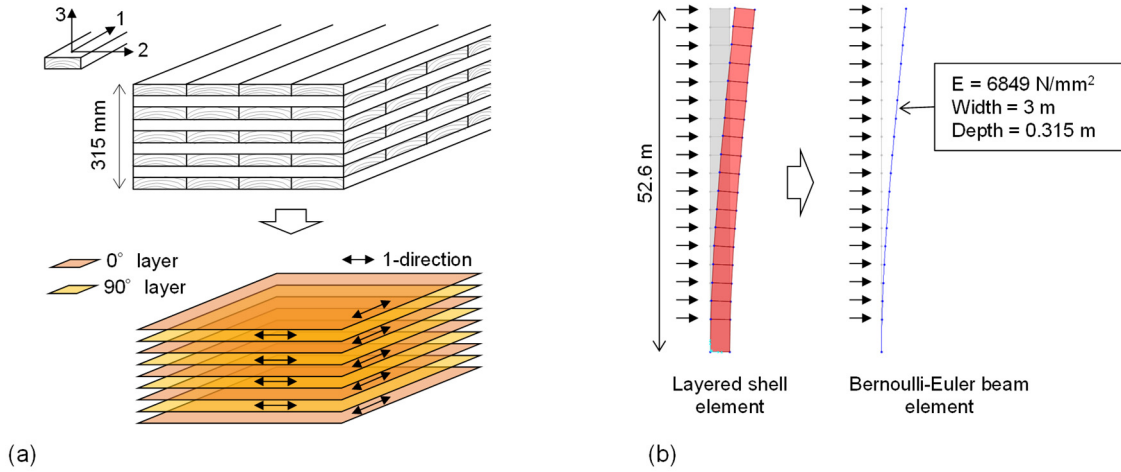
Modelling of the CLT wall panel: (a) Layered shell element for the CLT, (b) Equivalent Bernoulli-Euler beam for the CLT wall panel.
